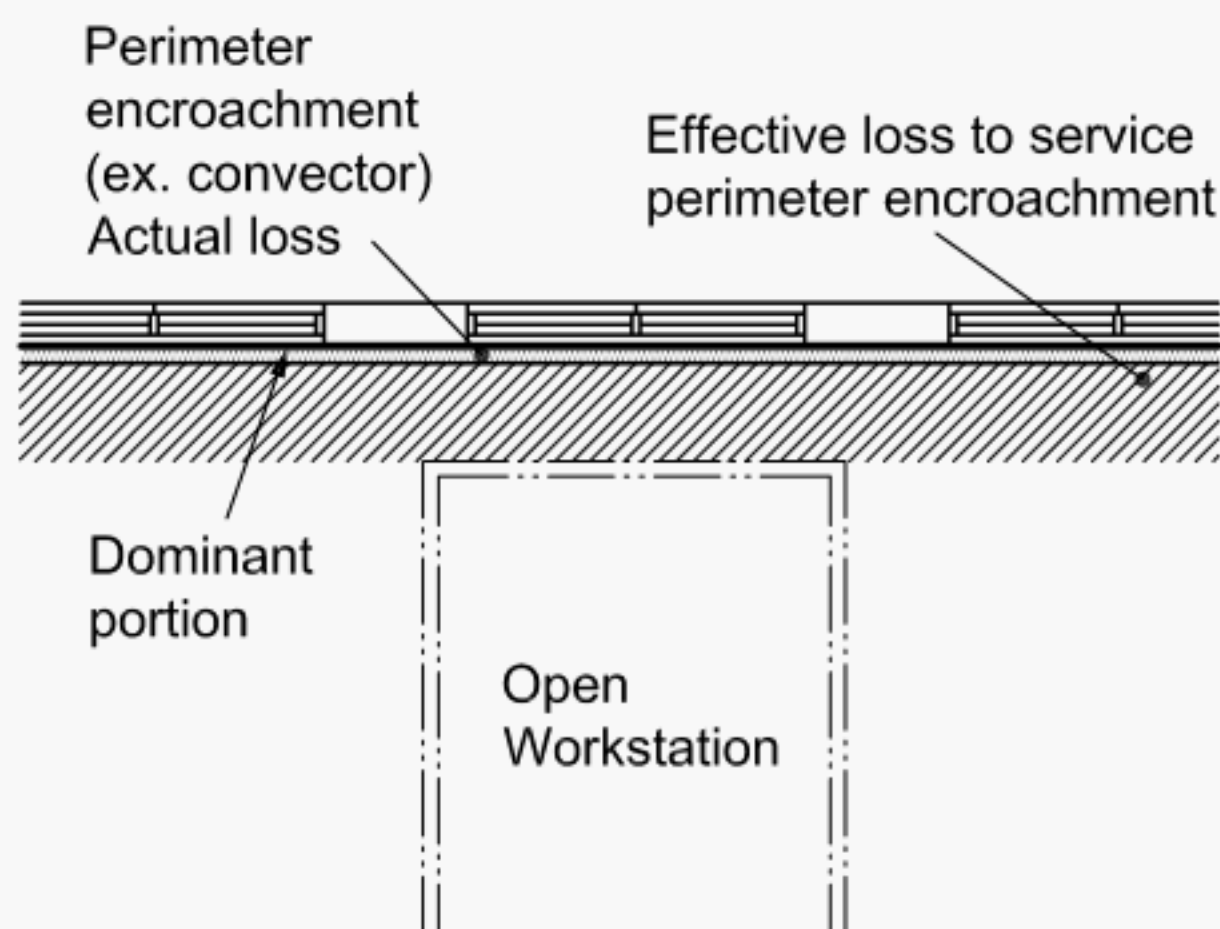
Uneven encroachments force workstations to be placed further from wall
